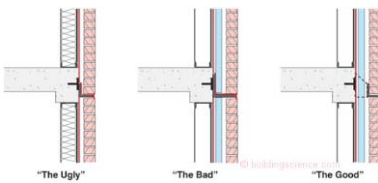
Examples of two poor and good details for metal lintels for supporting a cavity brick wall.
